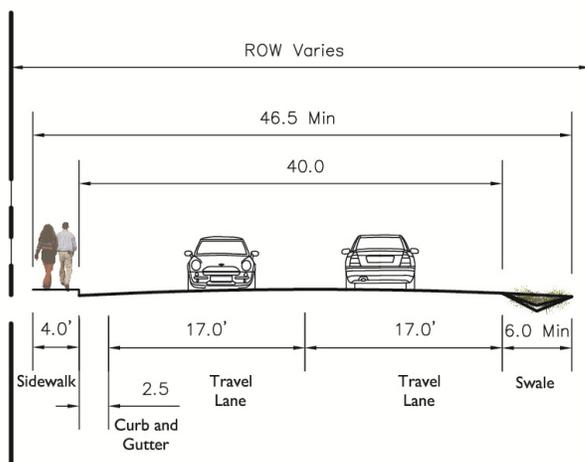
PROPOSAL B PROPOSED SECTION
